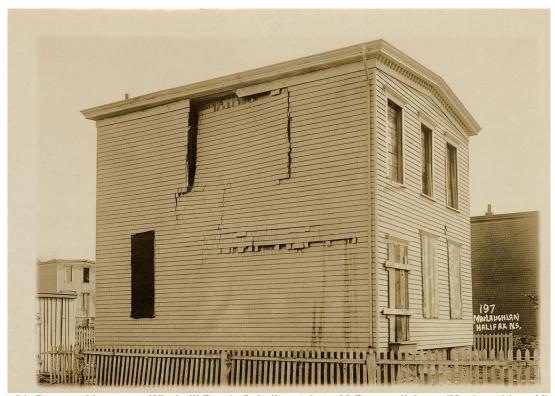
Damaged house on Windmill Road of similar style to 20 Ropewalk Lane (MacLaughlan, Album 2, No 197).
